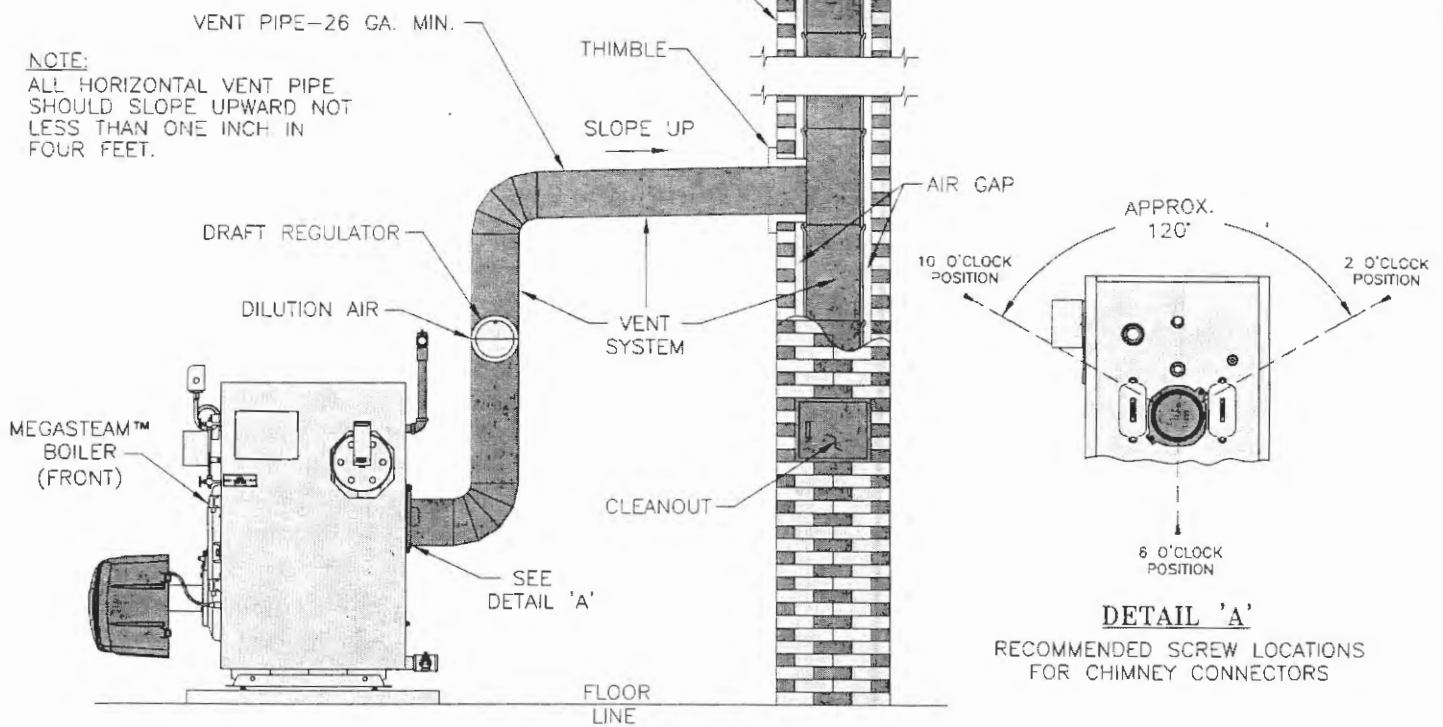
Recommended Vent Pipe Arrangement and Chimney Requirements
